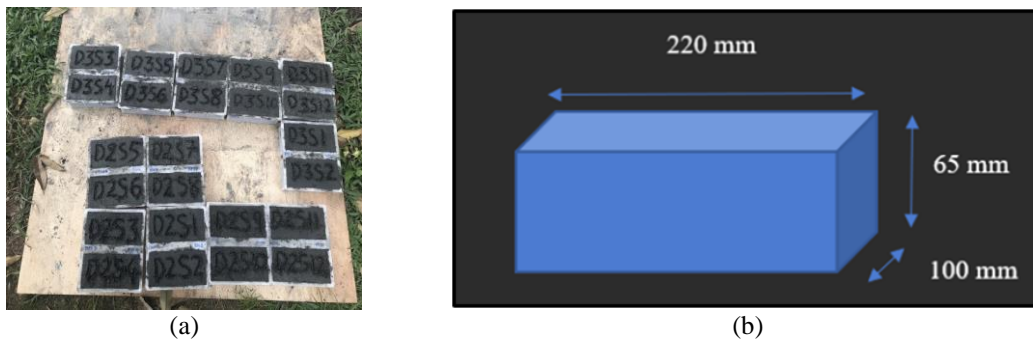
Samples preparation; (a) after moulding; (b) mould size
